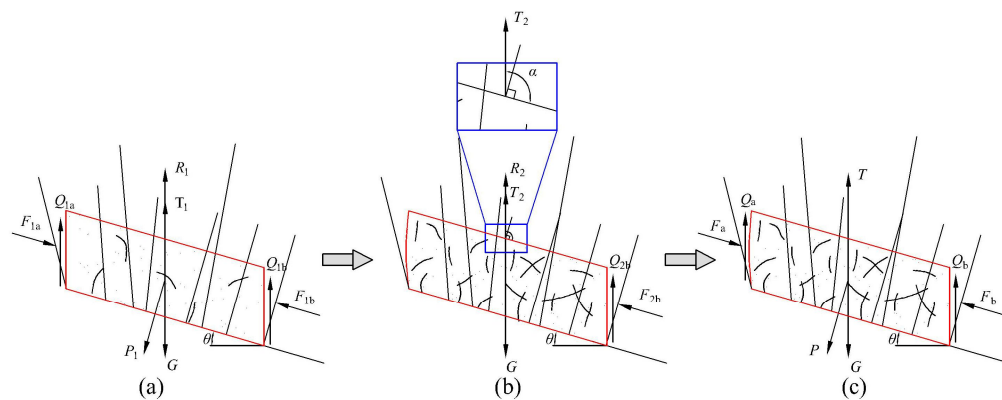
Roof rock mass force; (a) Force of cross section A - A ; (b) Force of cross section B - B ; (c) Force of cross section C - C .
